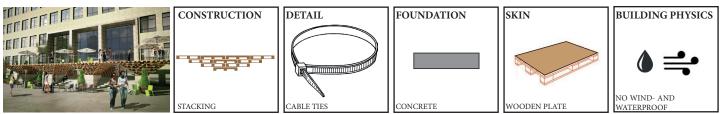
1x1 Pavilion. Source: Fig 11. Connection, detail, foundation, skin and building physics method. (Own image) (Grozdanic. L, 2014)
